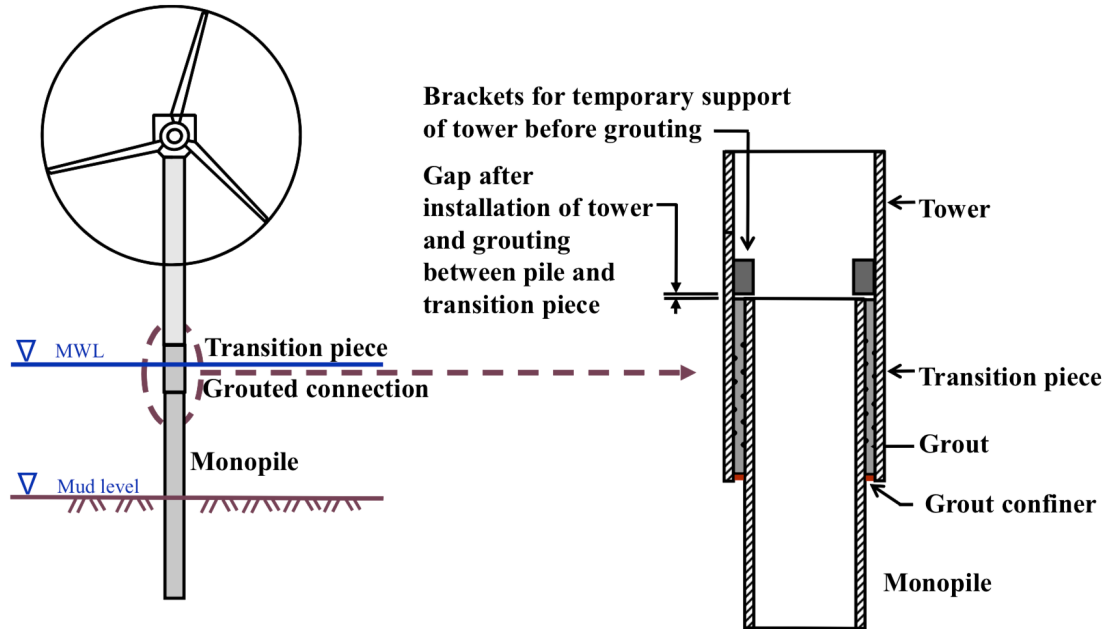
Principle of grouted connection in monopile structure [1]
